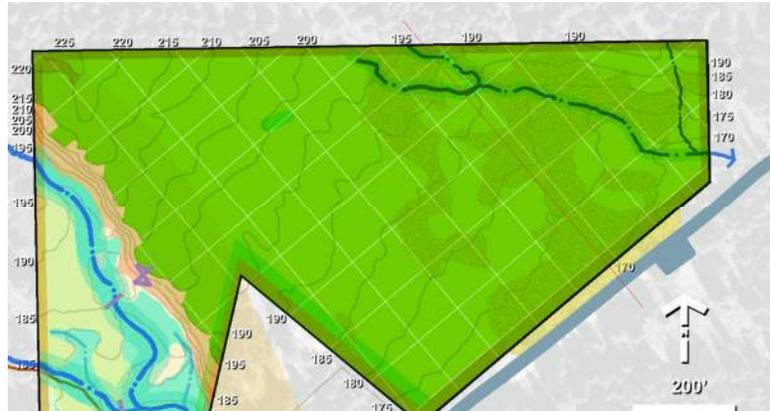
Girdwood Cemetery Master Plan – Central Area and Parking
